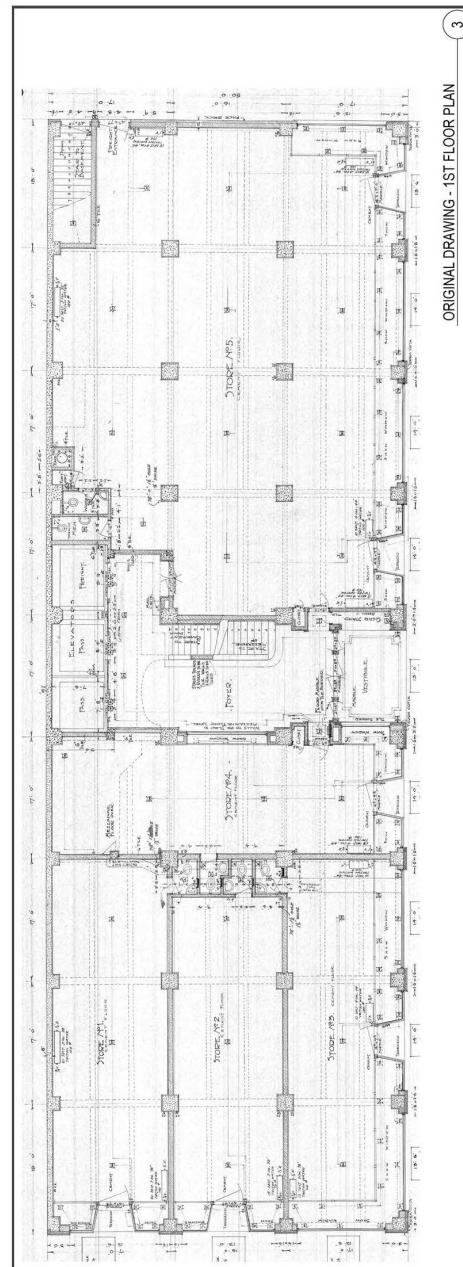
Original first floor plan. Source: Loy L. Smith, "Lane Mortgage Building, S.W. Corner of 8th and Spring Streets, Los Angeles," January 4, 1922, City of Los Angeles, Department of Building and Safety
